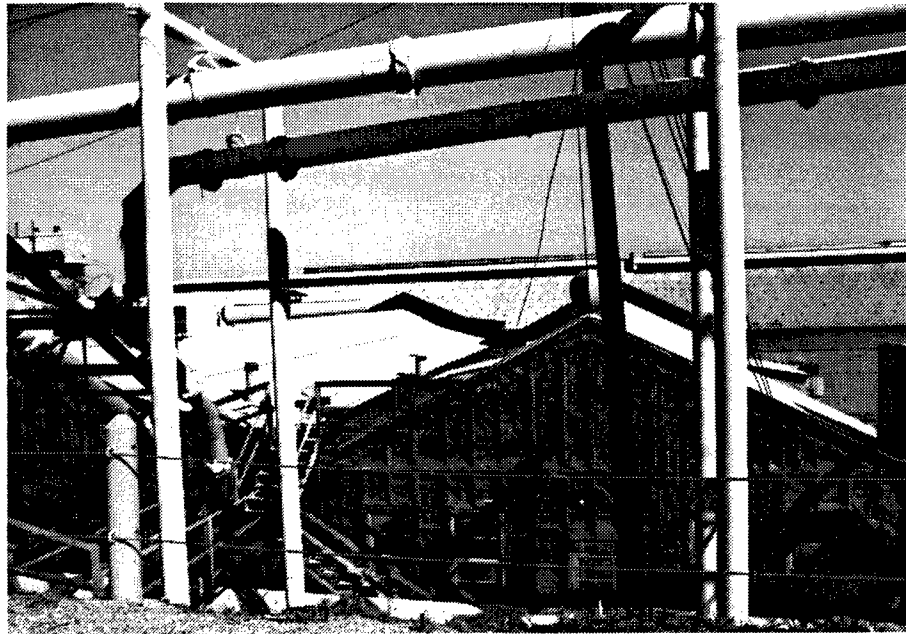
Building 2010: This photo reveals a different wing design; otherwise, it is structurally similar to Building 1010 and has spray foam, rather than aluminum siding, on an exterior wall to provide a safer building material and to insulate the building's contents.
